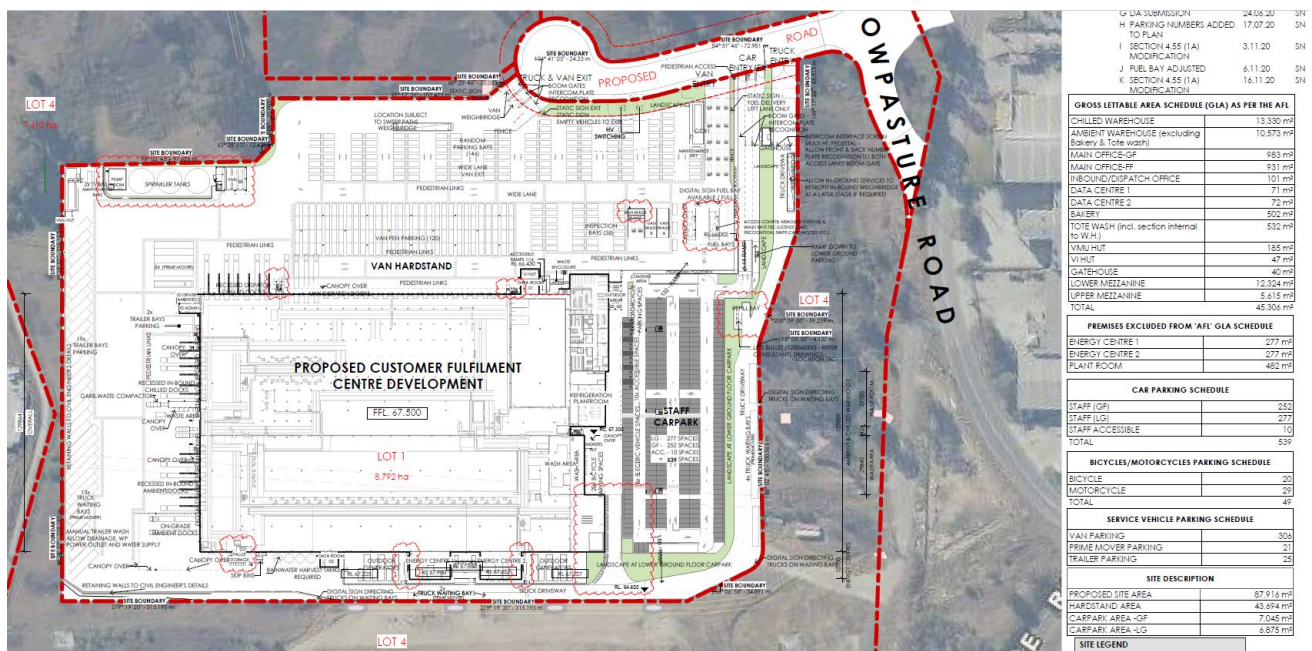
Proposed Overall Site Plan (DA020, Rev K)
